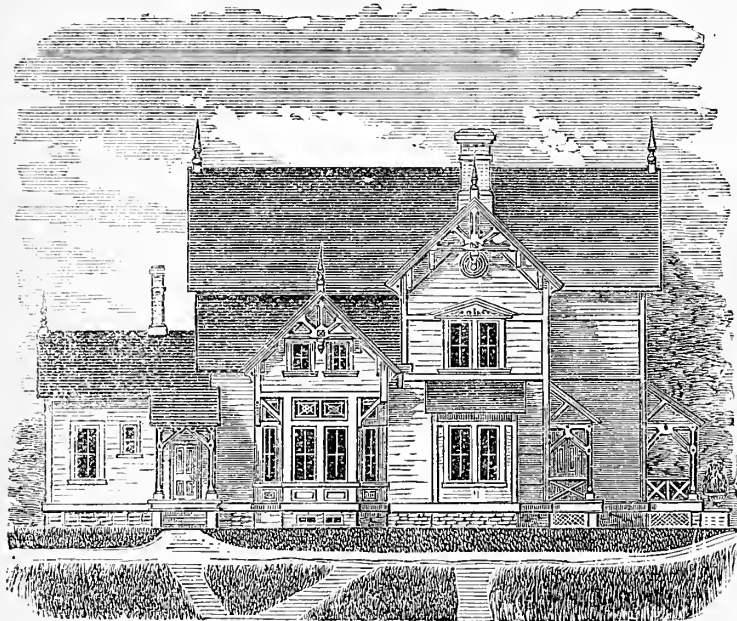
SIDE ELEVATION OF THE HOUSE.
